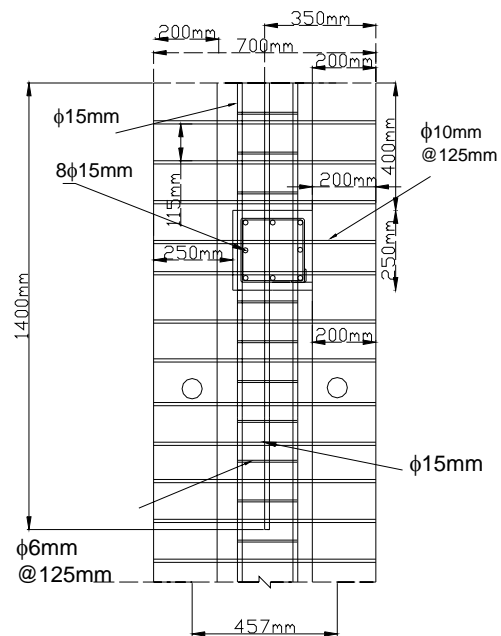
Gravity load designed reinforced concrete frame dimensions and reinforcement details
